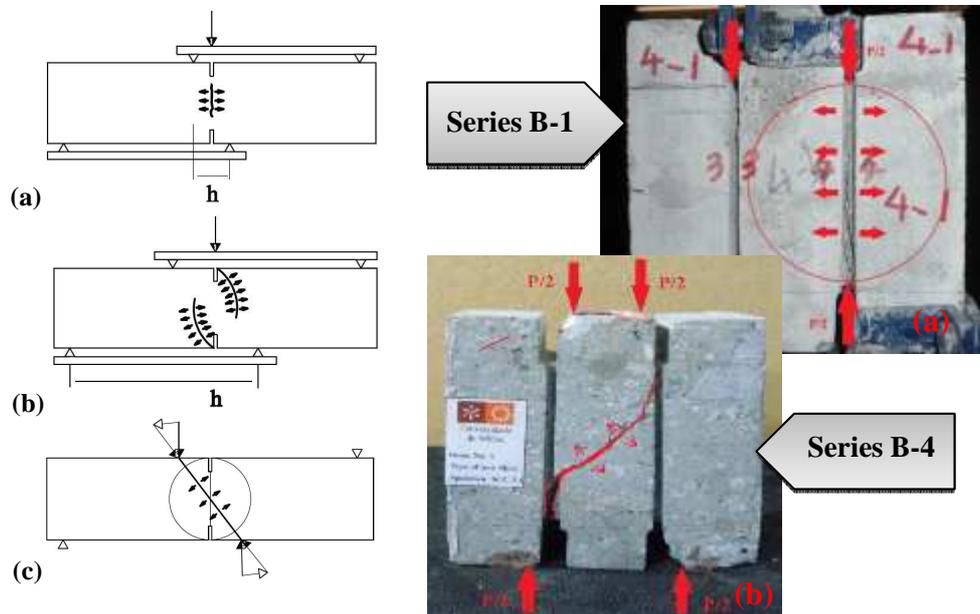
(left) Shear failure of beam (a) tensile splitting, (b) mixed mode crack propagation and (c) diametrically loaded beam [5 and 33] (right) (a) Crack pattern of series B-1 and (b) B-4 of specimens
